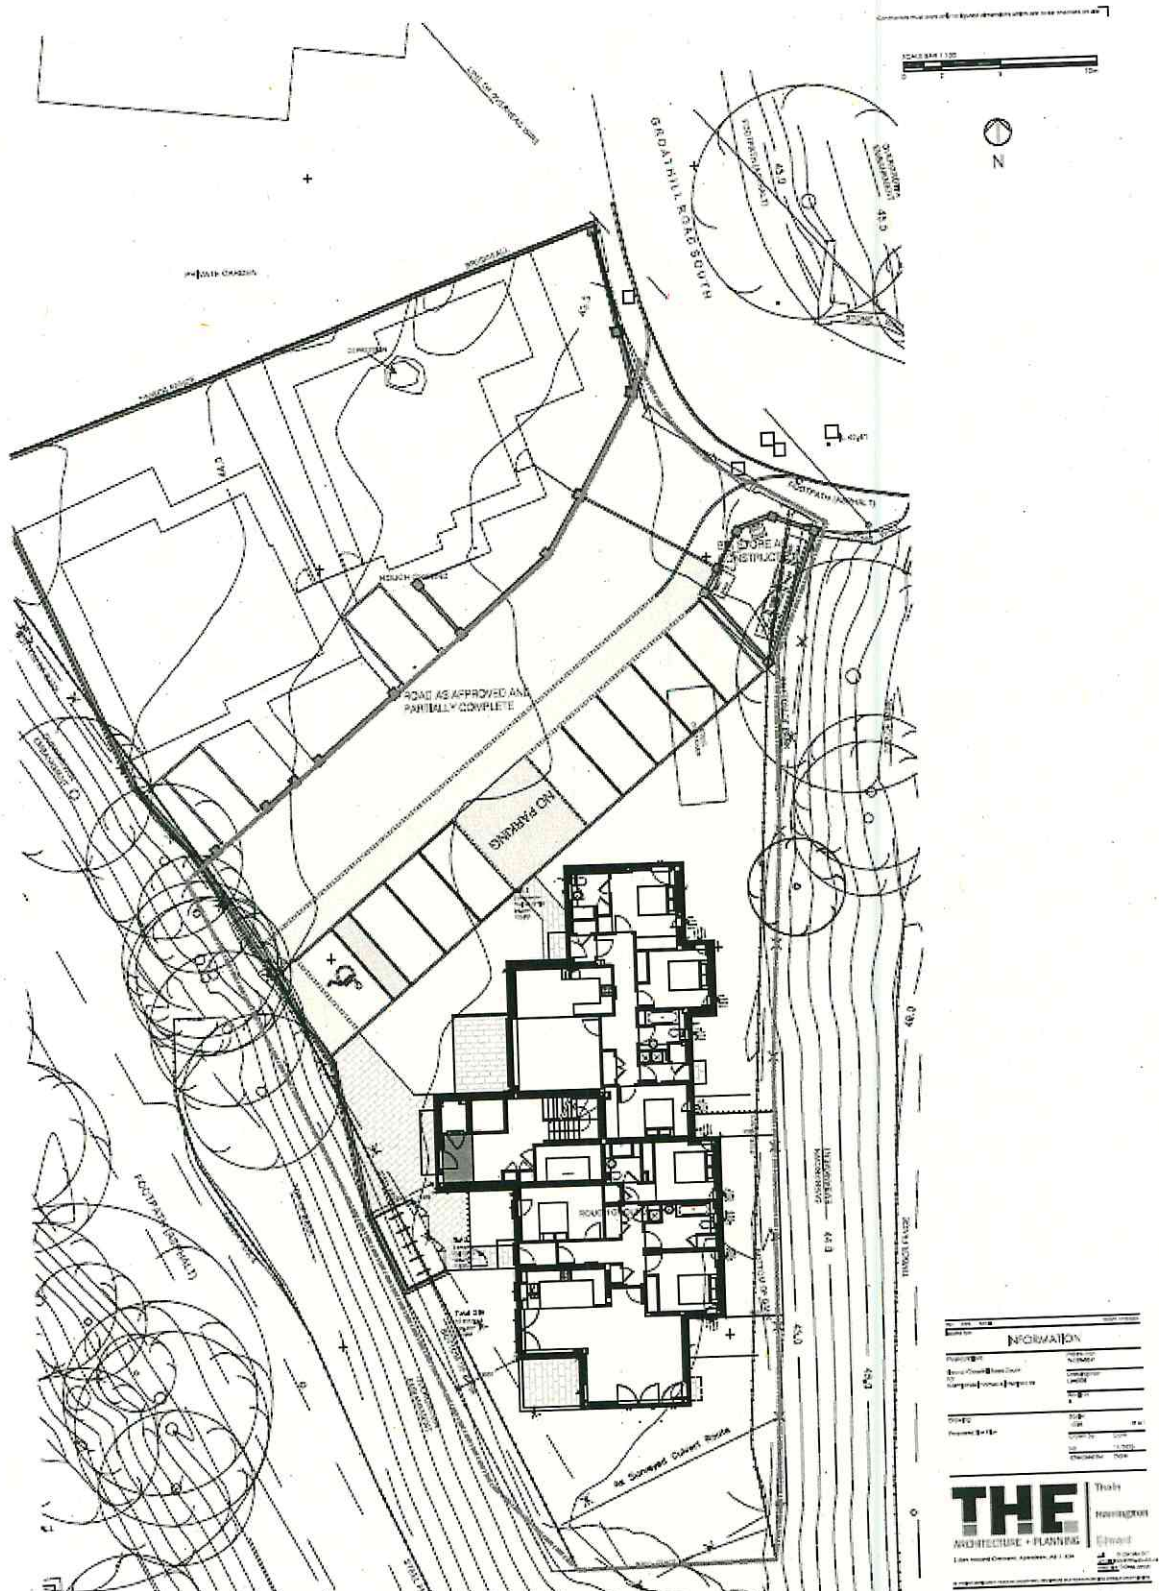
Indicative site plan of the Groathill Road South development (Source: THE Architecture & Planning)
